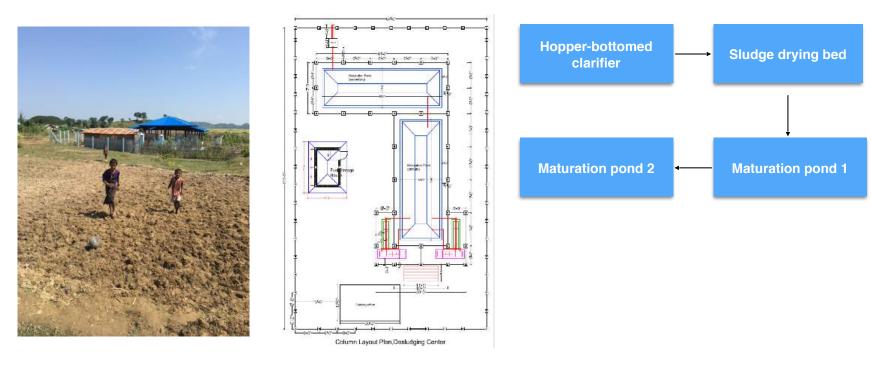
Sludge treatment facilities in Kyein Ni Phin, Pauktaw; site plan; and sludge treatment process (DRC, 2018)
